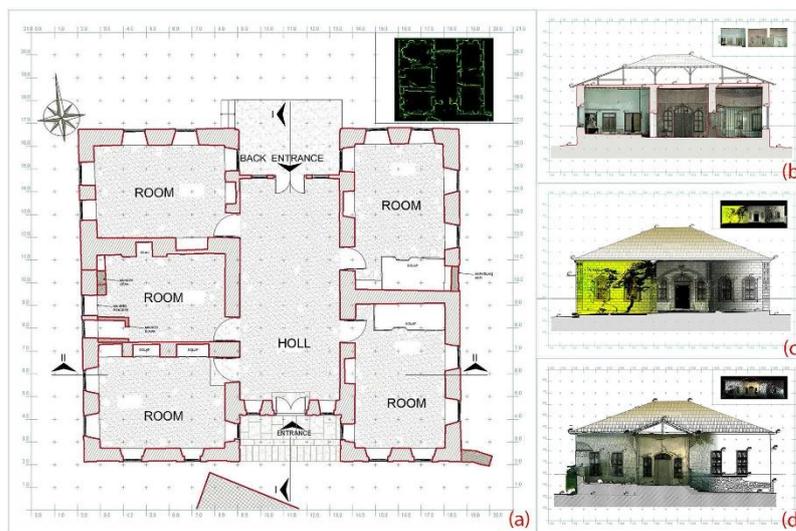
(a) Plan of building with exported points from Cyclone as dxf to Autocad. (b) One Section of Building. (c) South elevation drawing with ortho-images. (d) North elevation drawing with ortho-images.
